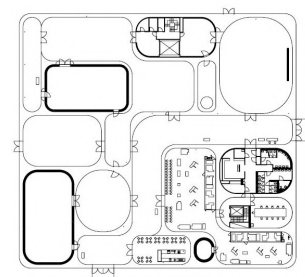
Floorplan of the Glass Pavilion, by SANAA (source: Moe (2008)).
